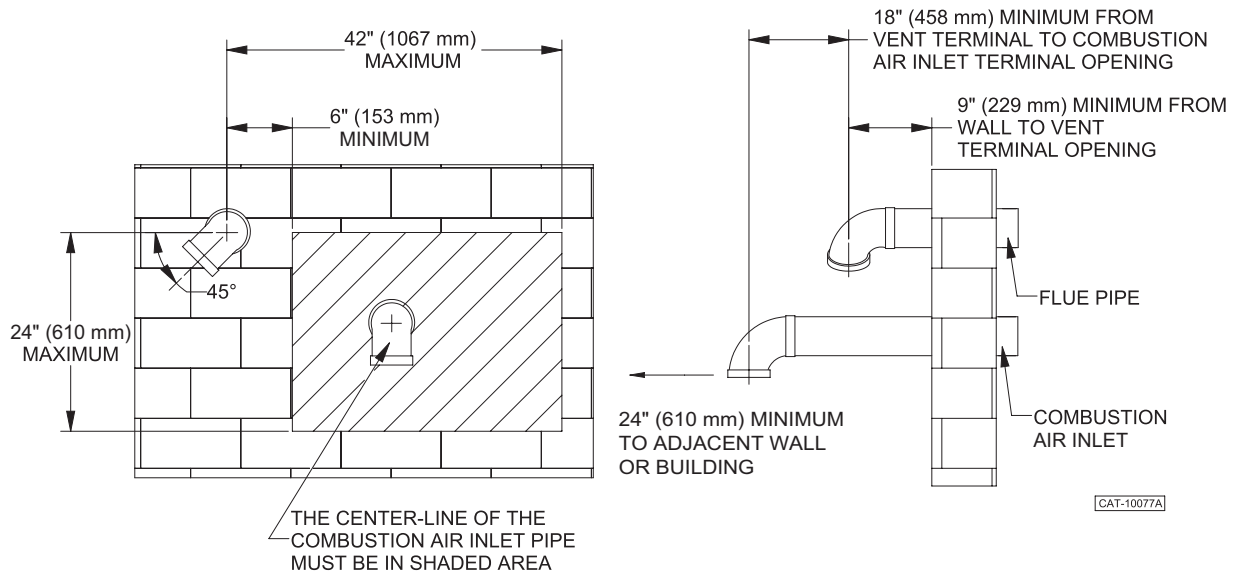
Horizontal Two Pipe Separated Combustion Venting, Sidewall Termination
